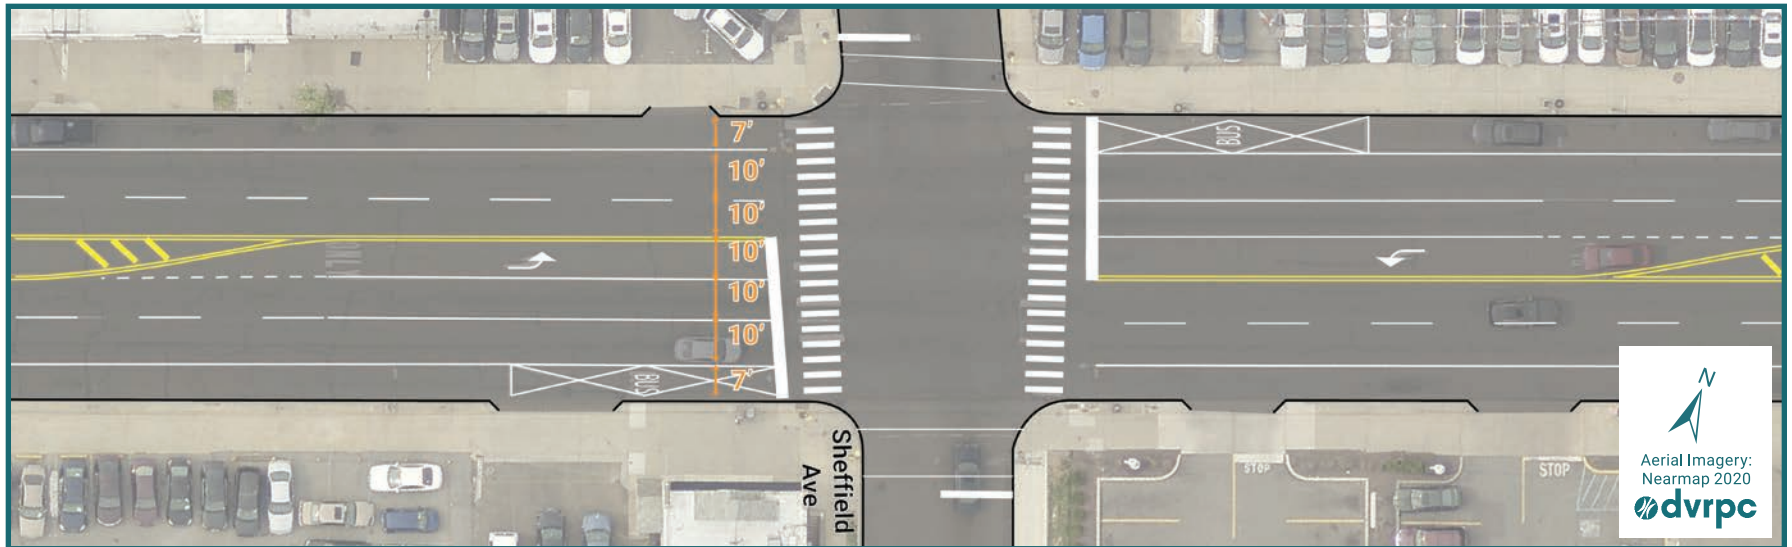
Frankford Avenue and Sheffield Avenue, Proposed
